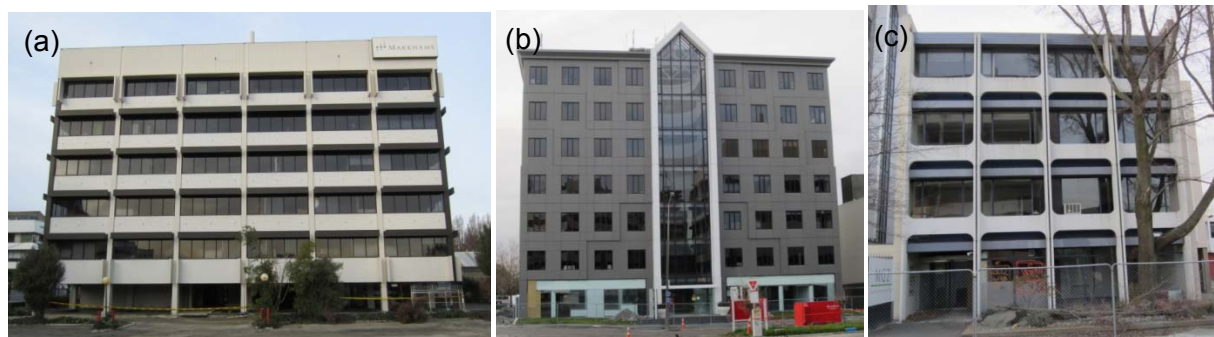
Zone 1 Building Group: (a) PILE-6, (b) FTG-7, and (c) FTG-4 buildings.
